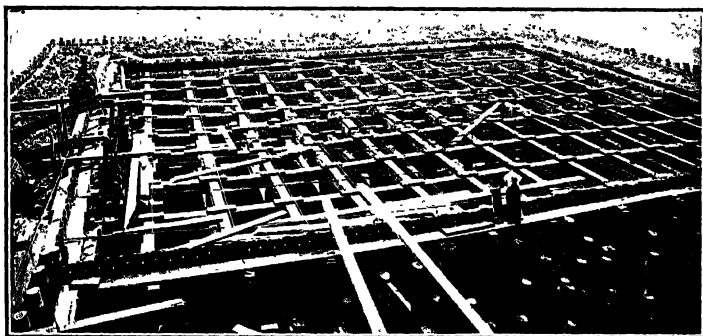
Cofferdam of the Boulevard Link Bridge in Chicago.
